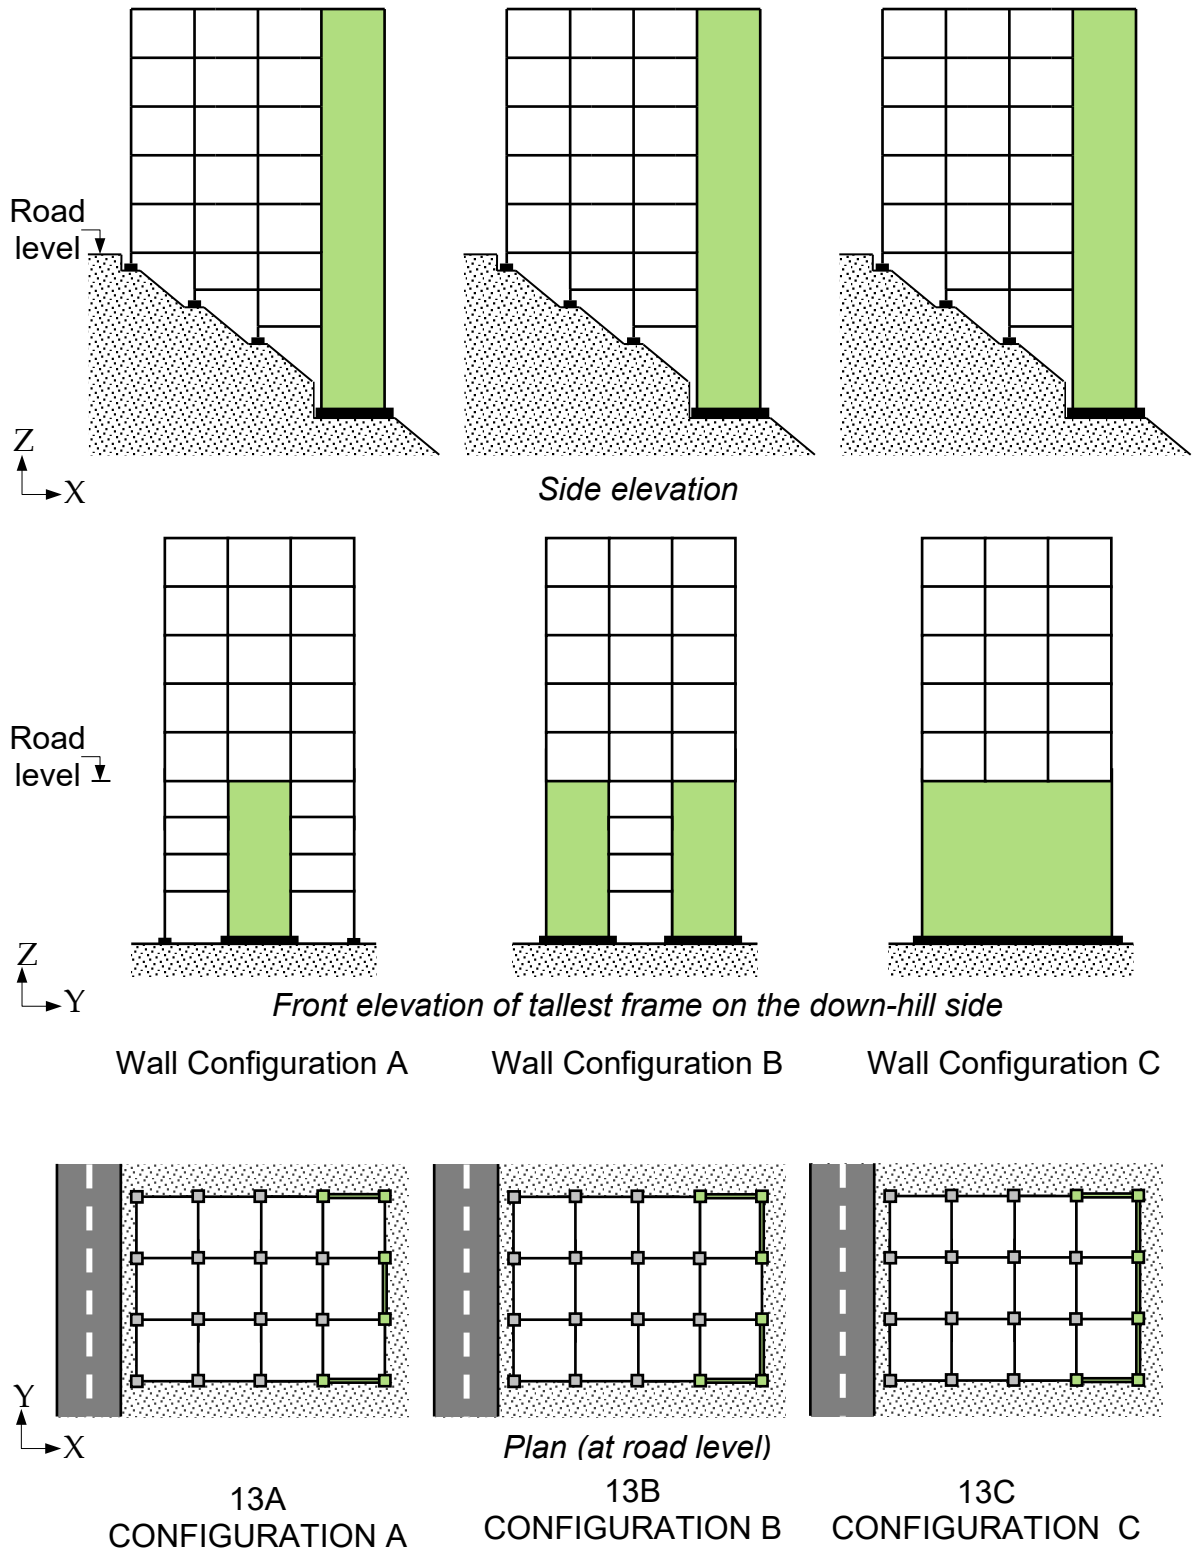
SUGGESTED RC WALL CONFIGURATIONS IN BUILDINGS ON HILL SLOPES
